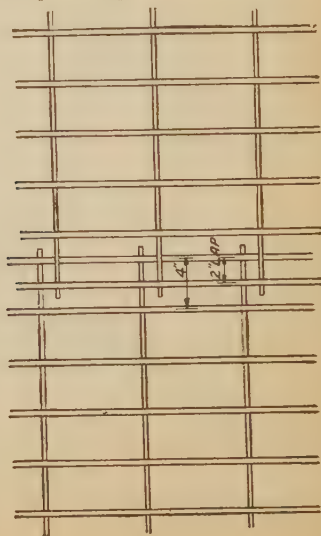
Inexpensive method of supporting wire fabric reinforcement over concrete beams.
